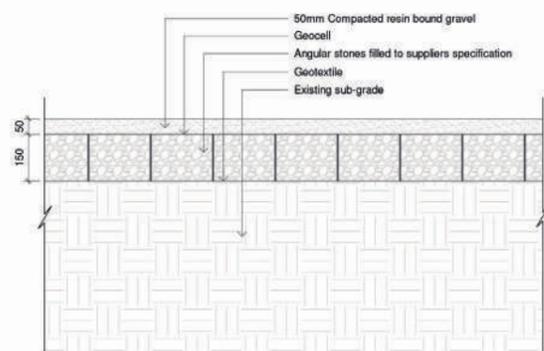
PERMEABLE PATH TYPICAL DETAIL
